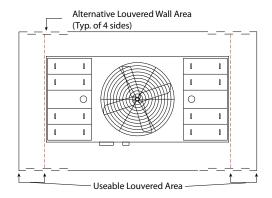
Plan View of Dual Air Intake Unit with Alternate Louver Arrangement
